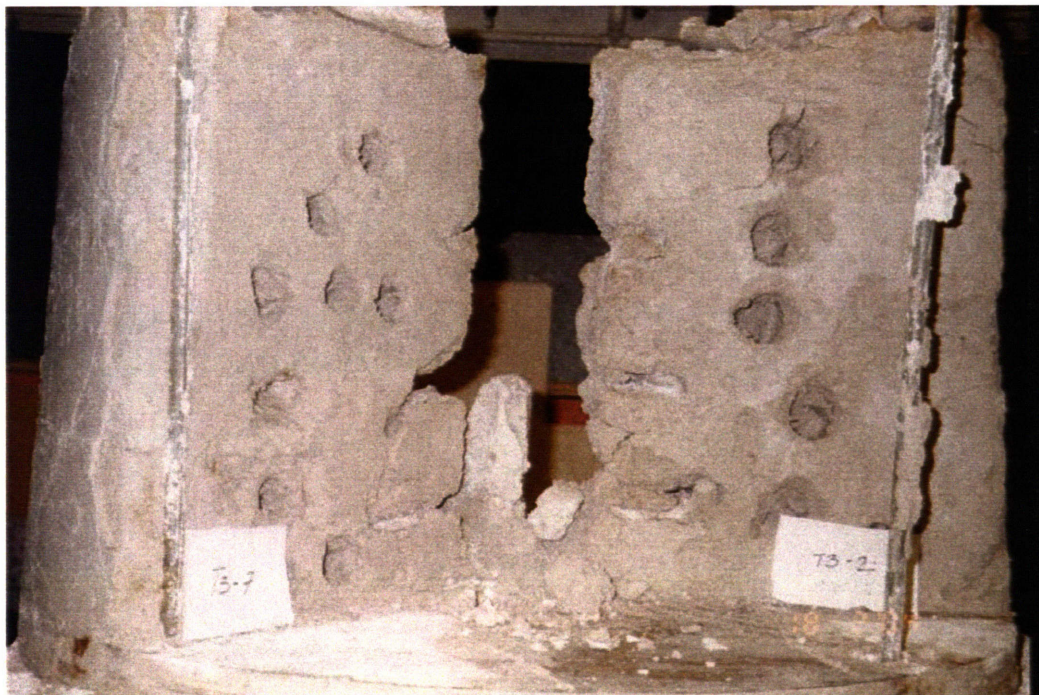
(g). View of exposed vertical soil face (Specimen T3, Section 7:left and Section 2:right)
